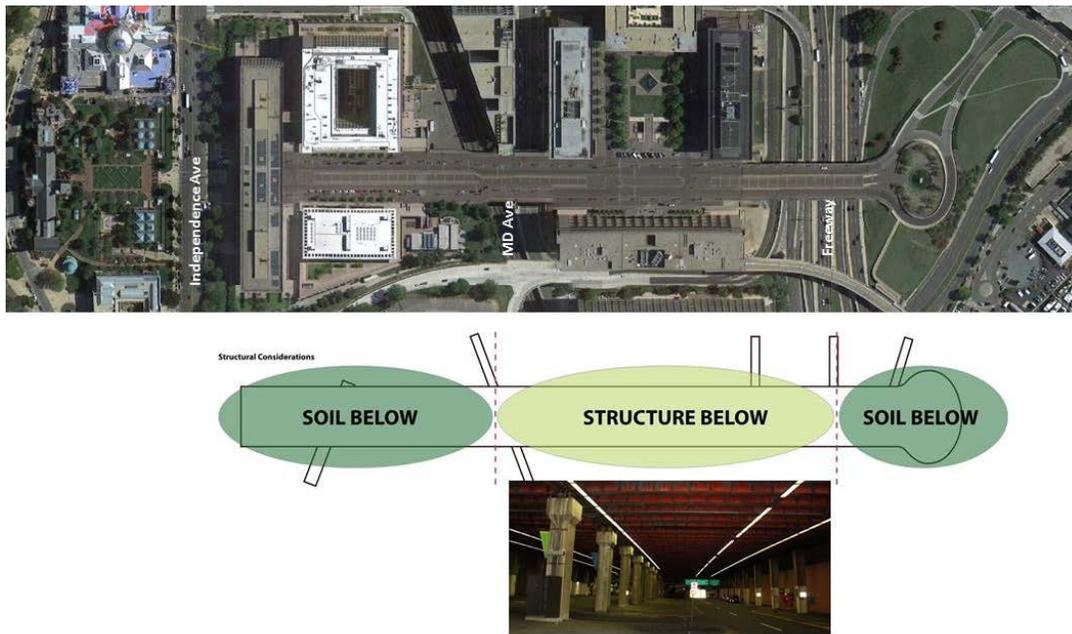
Over half of 10<sup>th</sup> Street is an elevated structure
